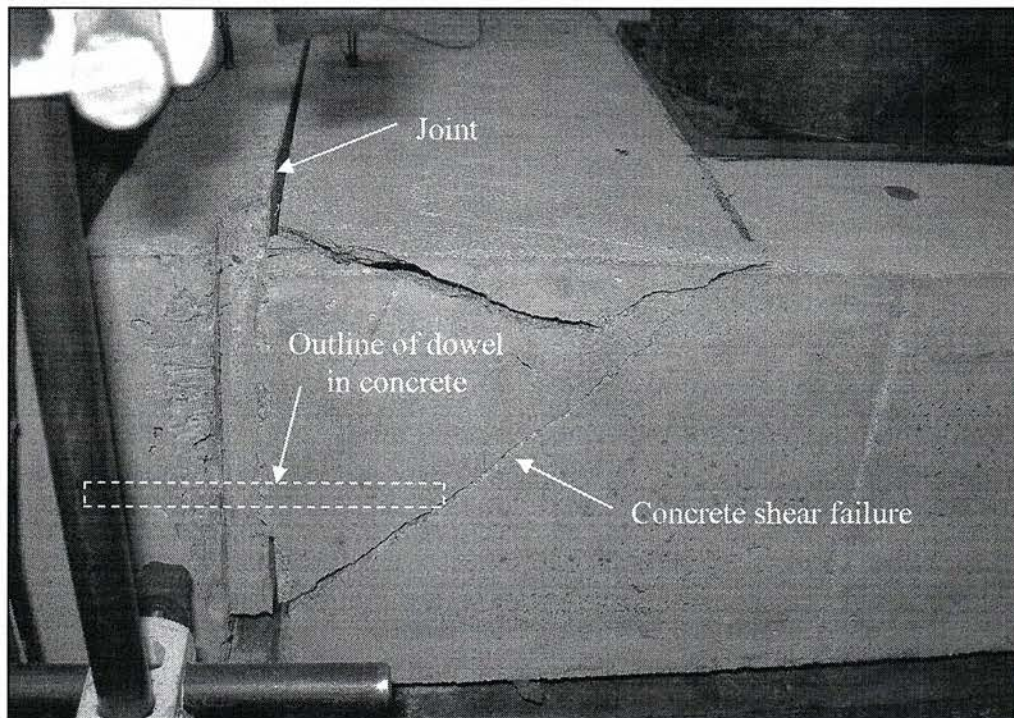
Typical concrete failure (square plate specimen)
